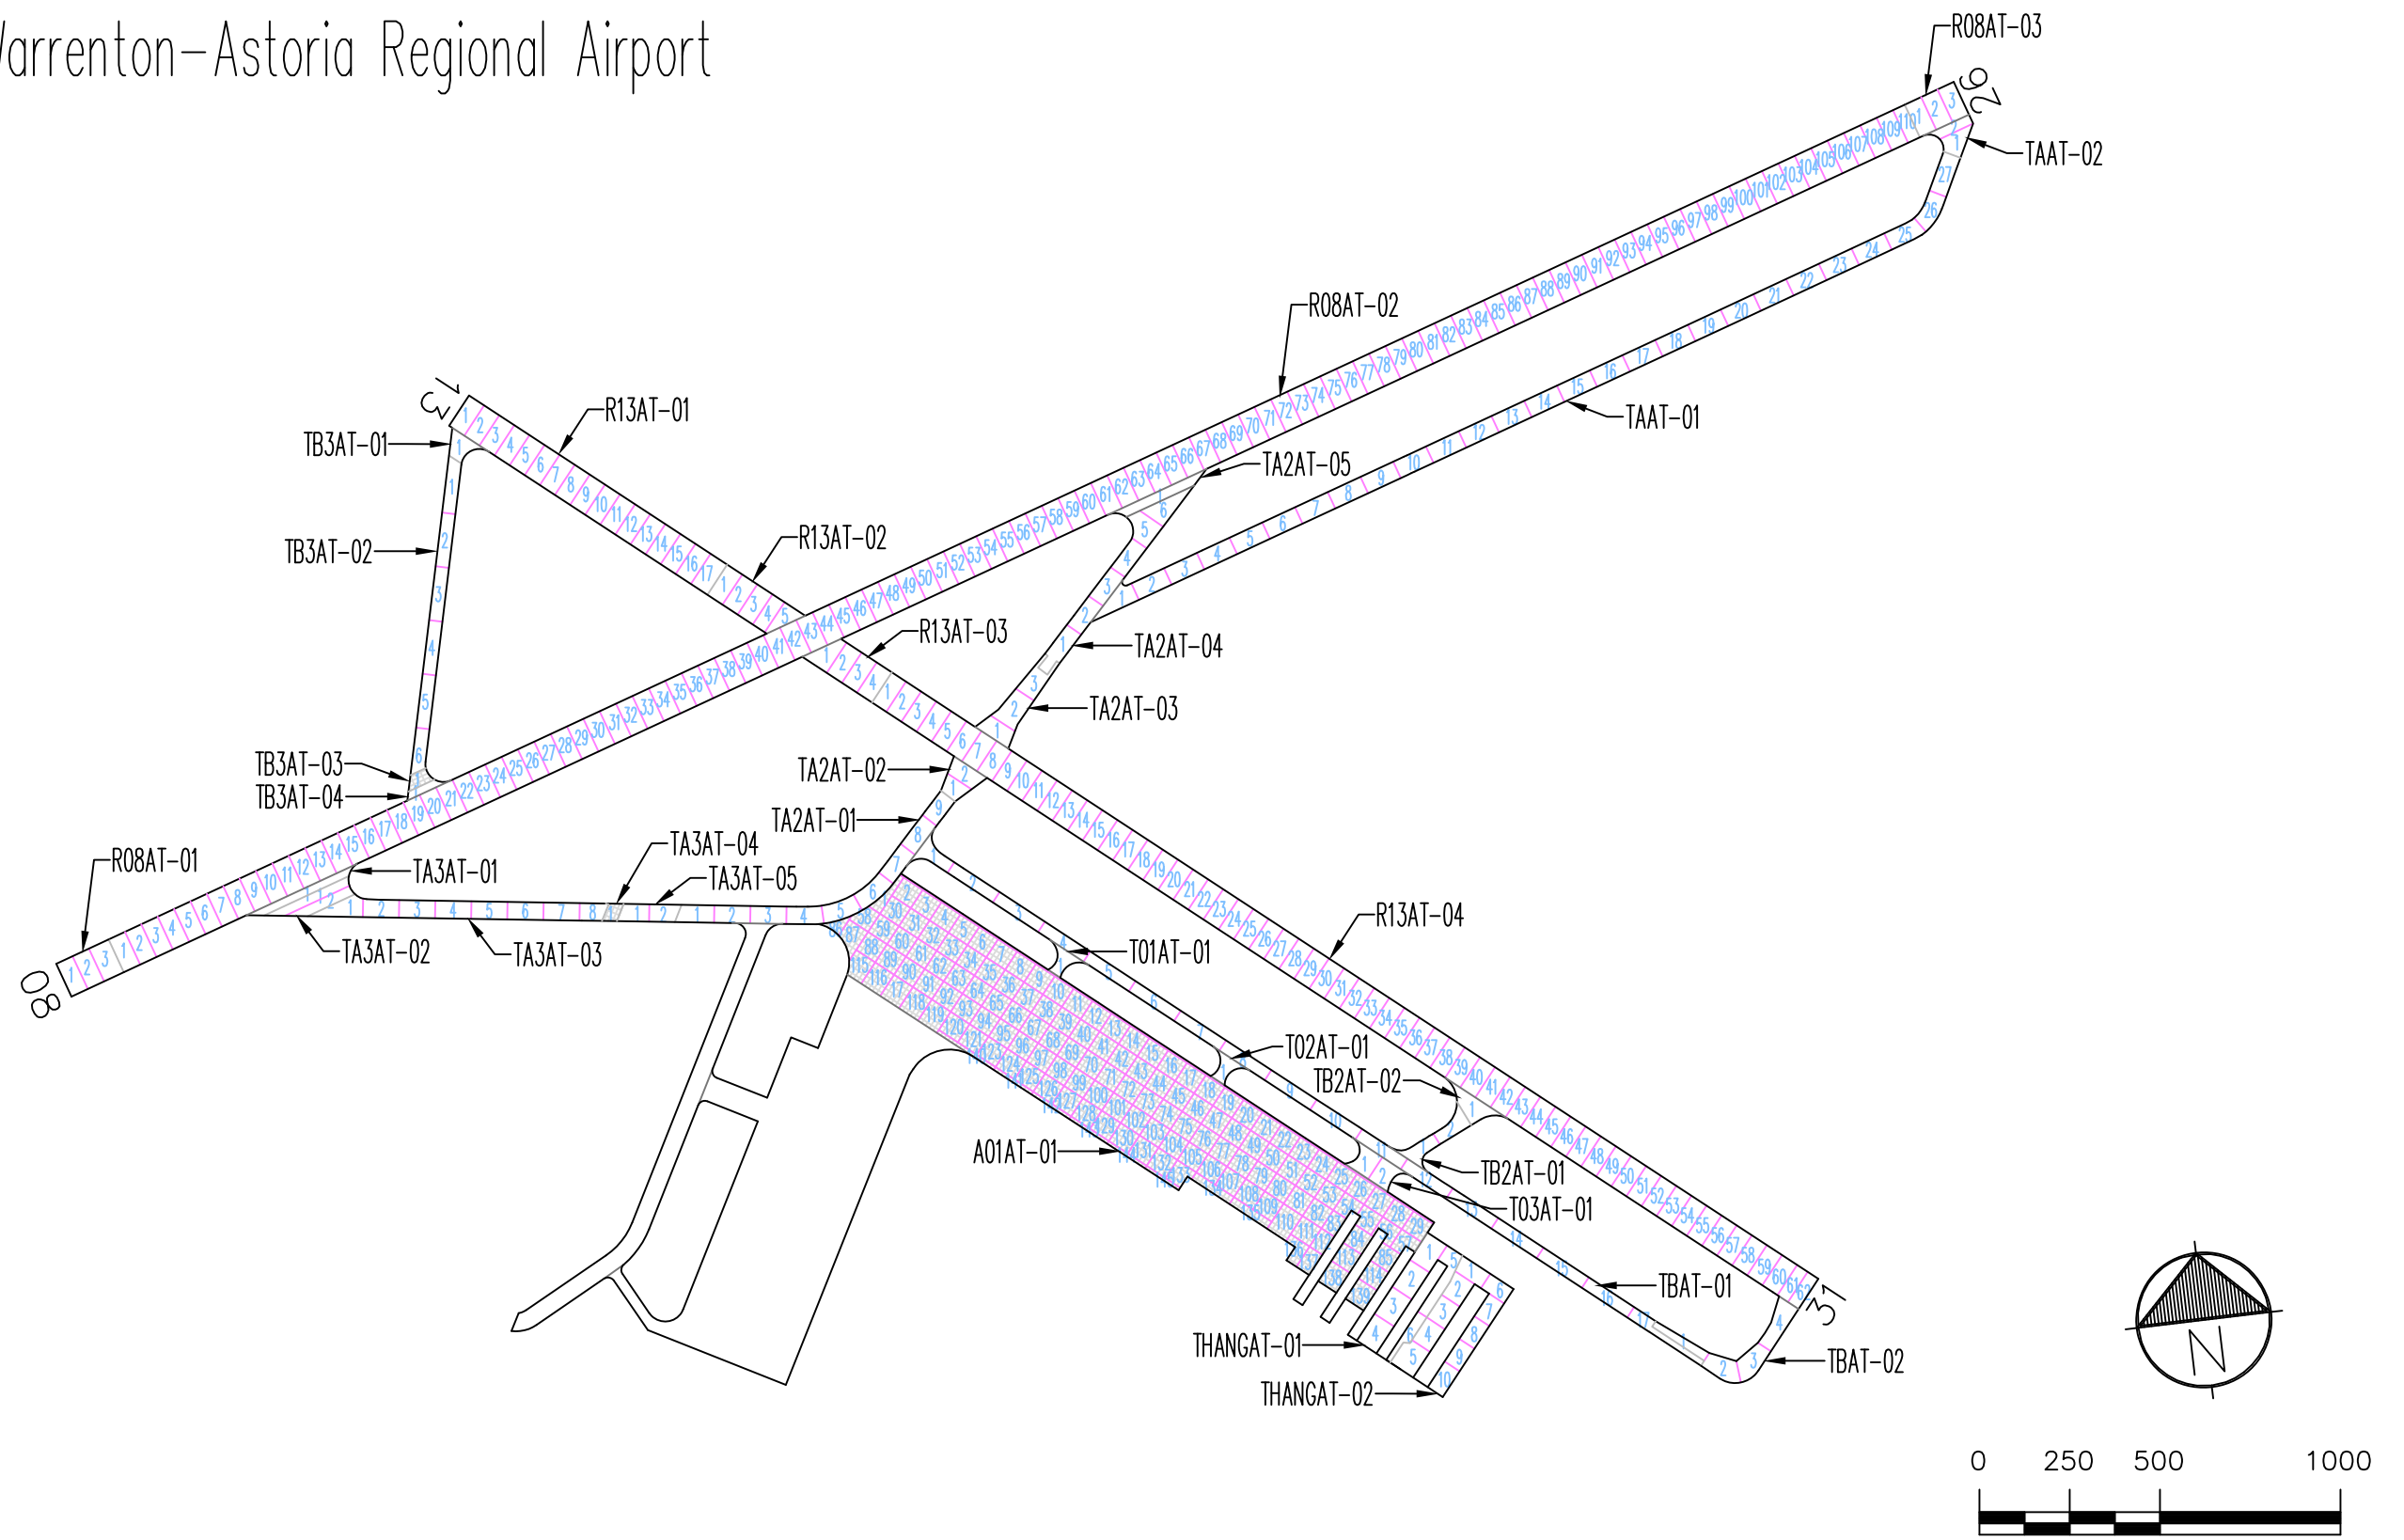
Pavement Branch, Section and Sample Unit Layout.
